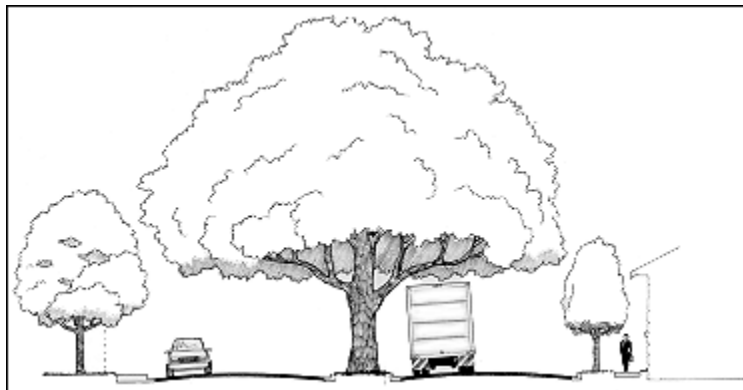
Street trees may be planted within a curbside treelawn, median, behind the curbside sidewalk in the boundary treelawn, or outside the right-of-way, on private property.
